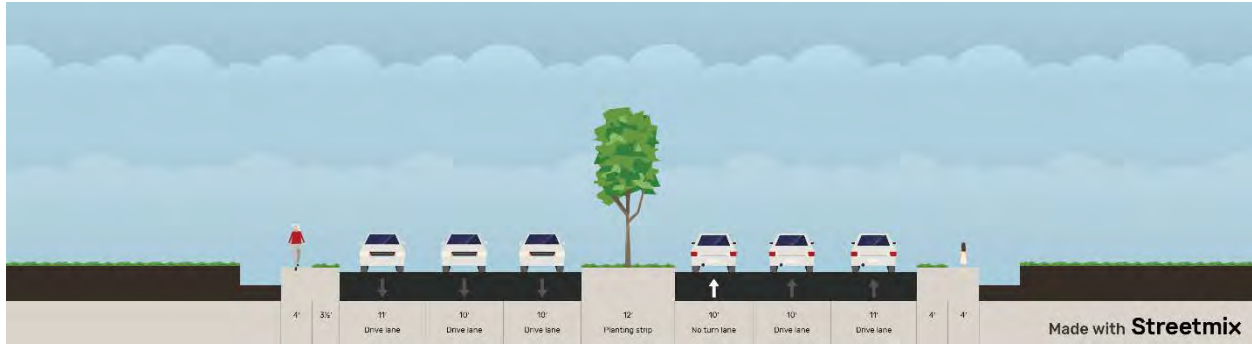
Typical 6-lane road cross section of Fondren Road north of West Airport Boulevard
